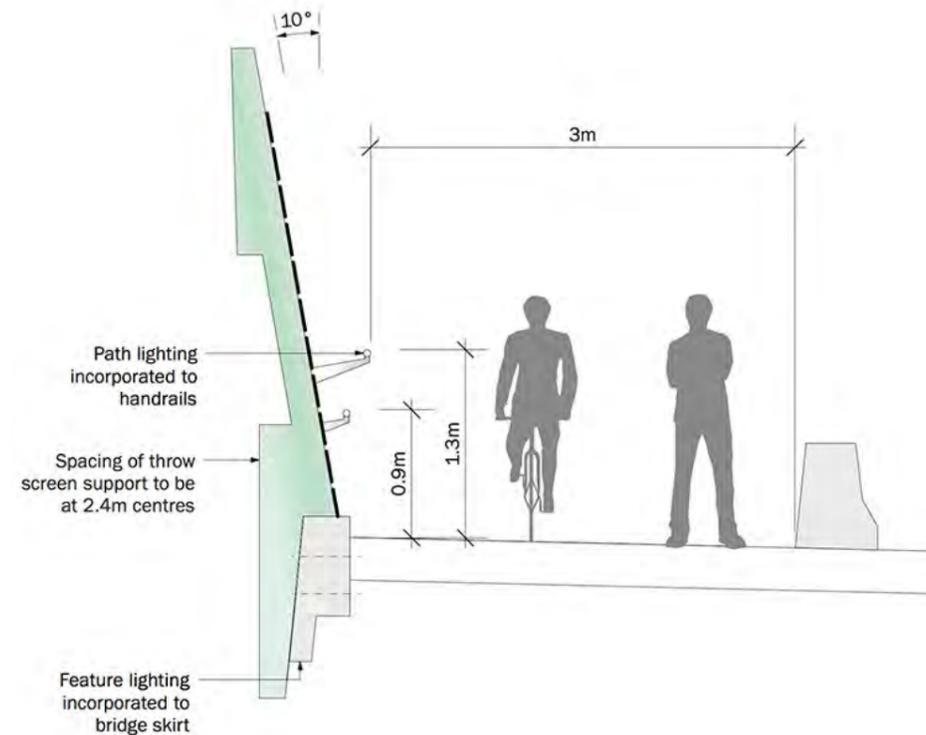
Bridge over M1 Princes Motorway - BR01 - Section (Scale 1:200)
